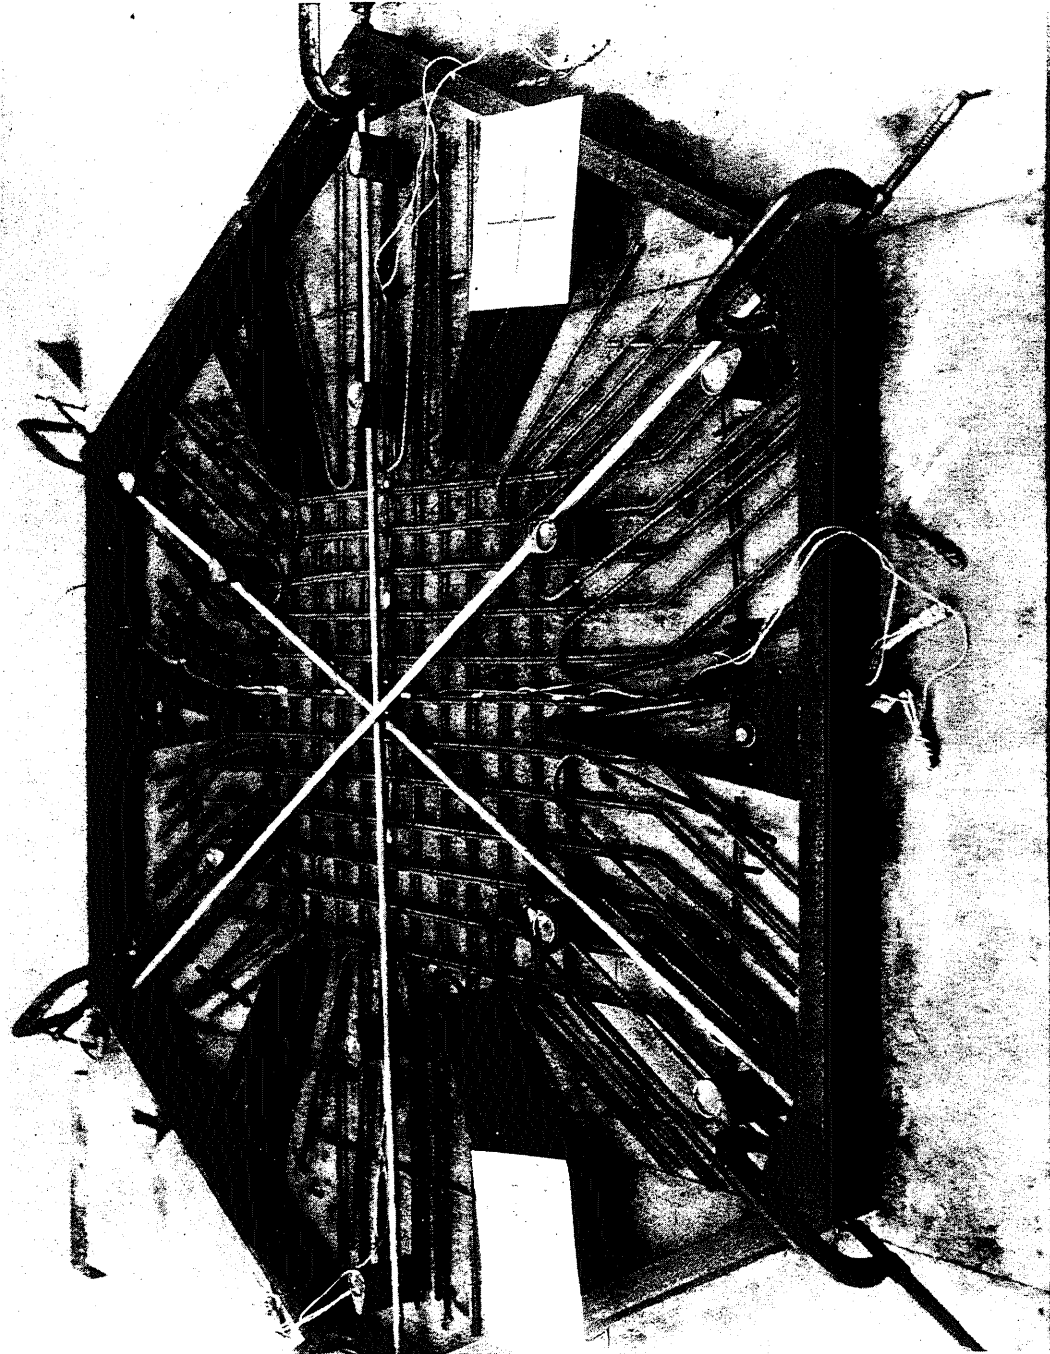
Photograph of Reinforcement in Slab FC1C
